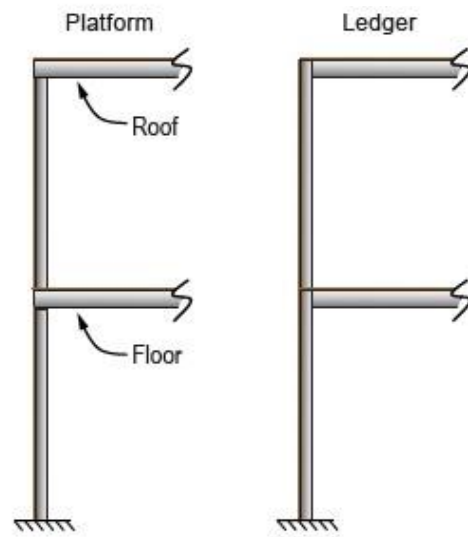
Framing types for CFS construction (Madsen et al., 2016)
